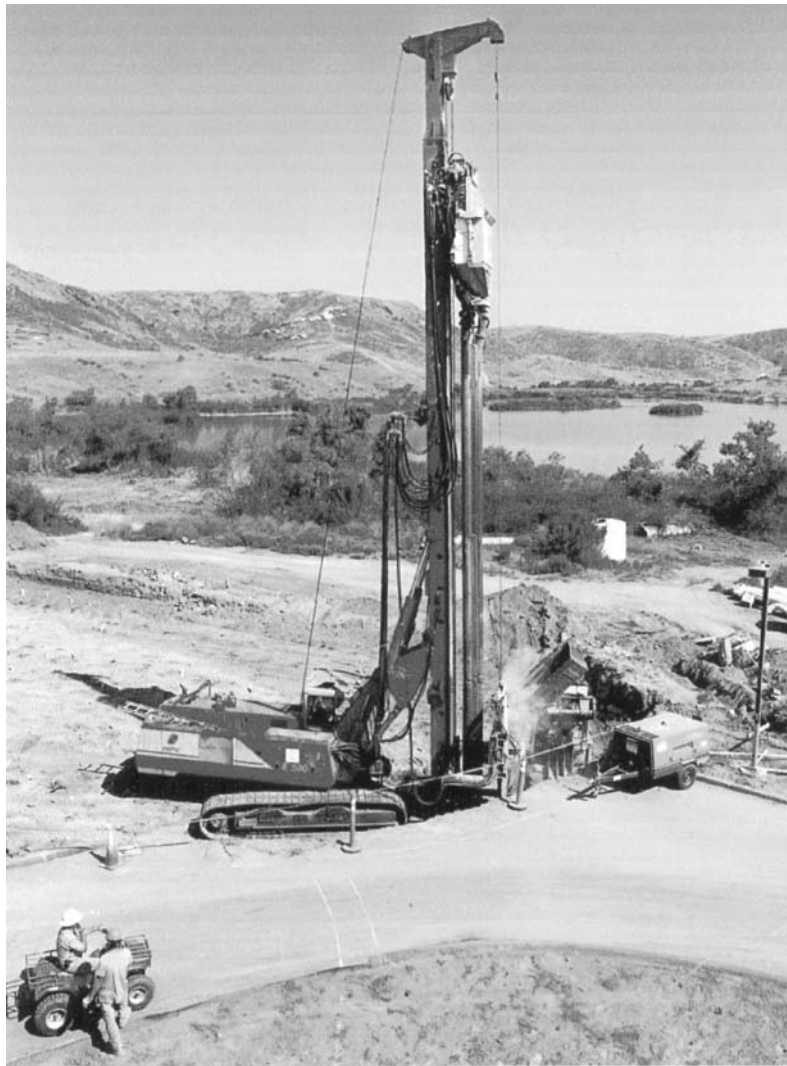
Construction of a stone column (Courtesy of The Reinforced Earth Company, Vienna, Virginia and Menard Soil Treatment Inc., Orange, California)
